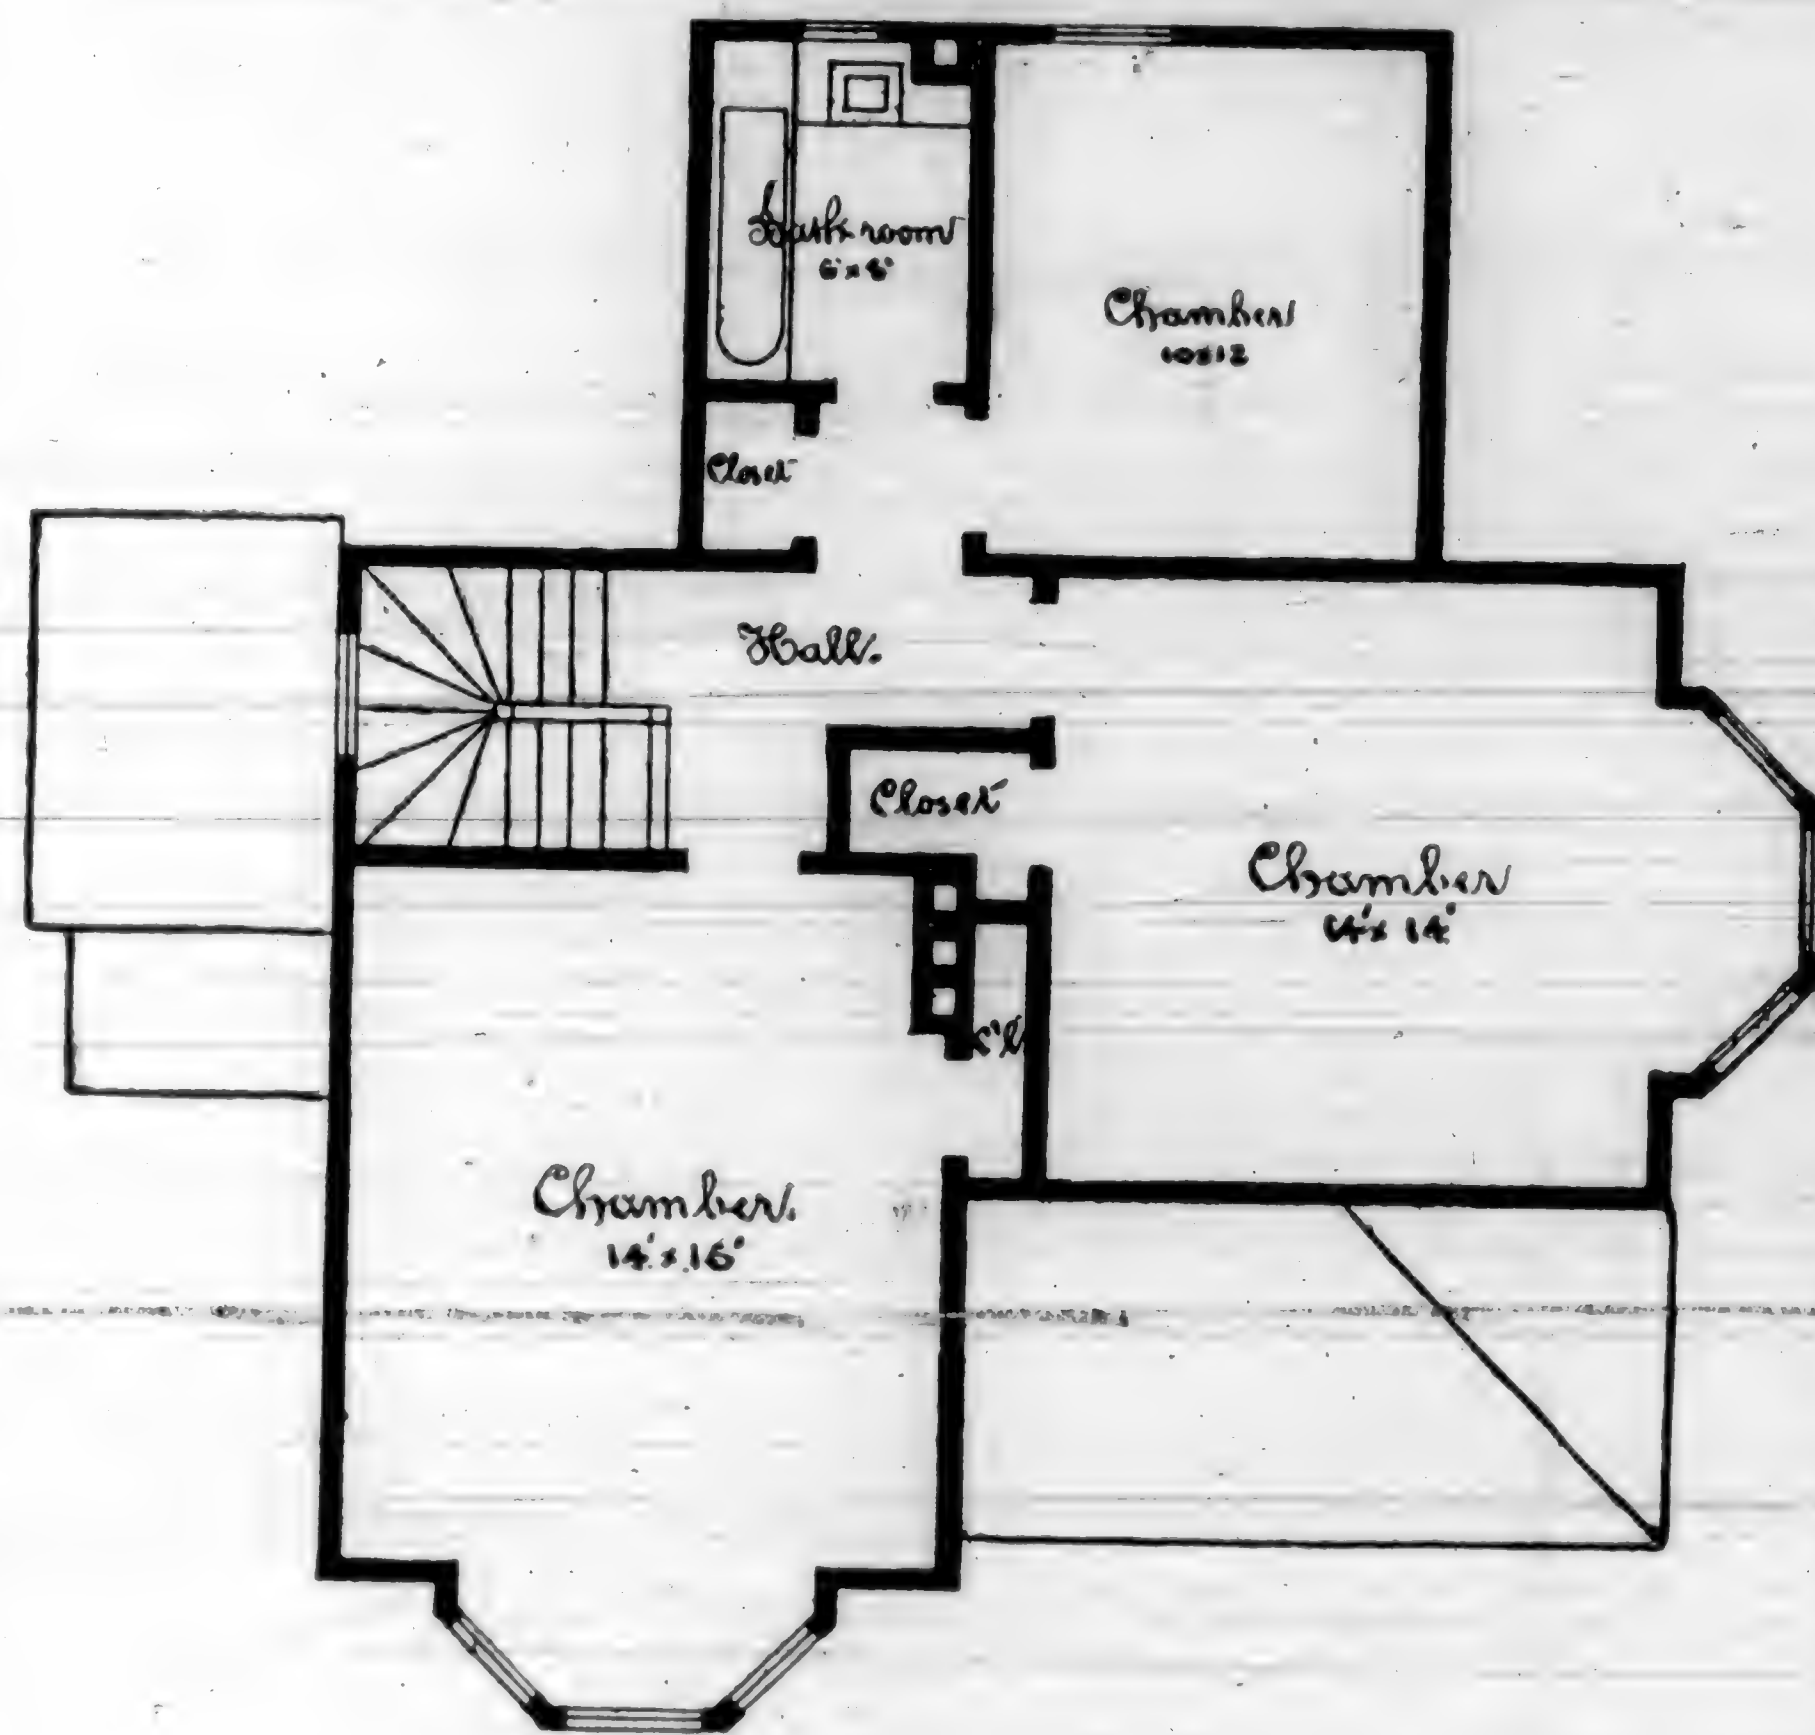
PLAN OF SECOND FLOOR, SUBURBAN DWELLING COSTING ABOUT \$3,000.
